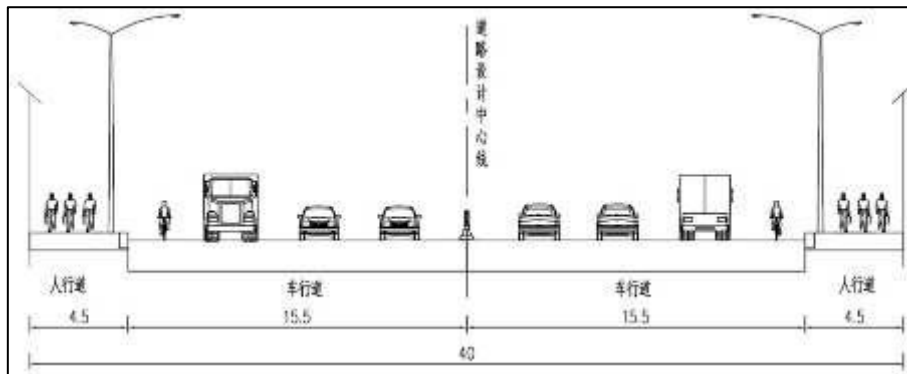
Cross-section of northern portion of Xinxing Avenue (SY)
